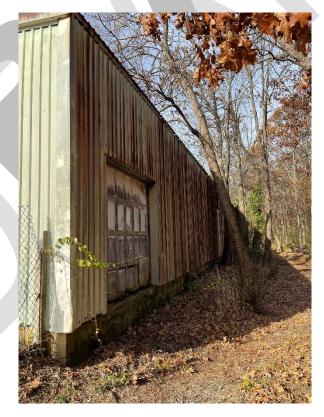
Exterior view of the Former Bottling Plant, east elevation of Volume B, camera facing northwest (November 17, 2023).
